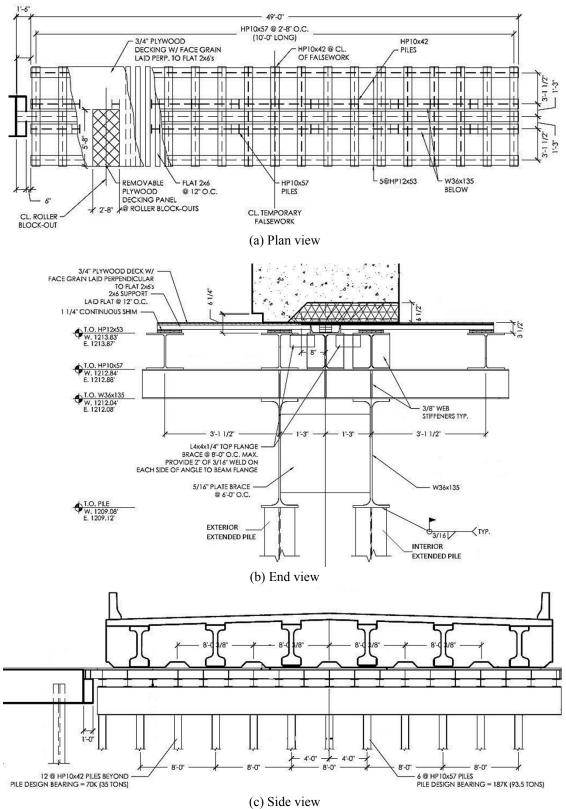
Plan, end, and side views of Massena Bridge temporary structure
